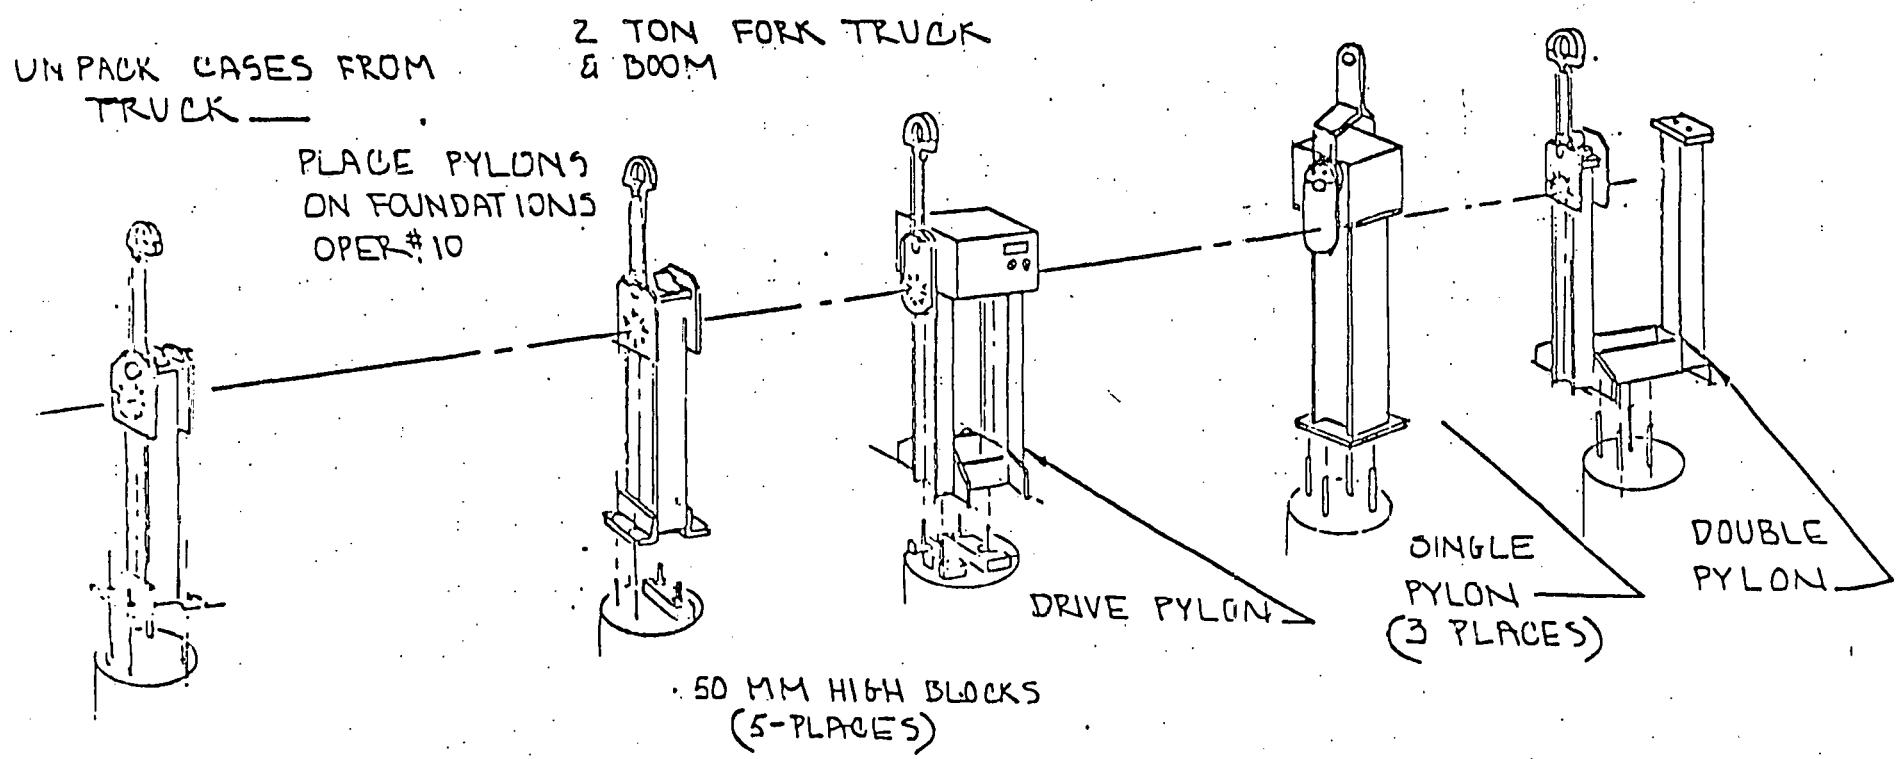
80 FT. COLLECTOR MODULE ASSEMBLY
